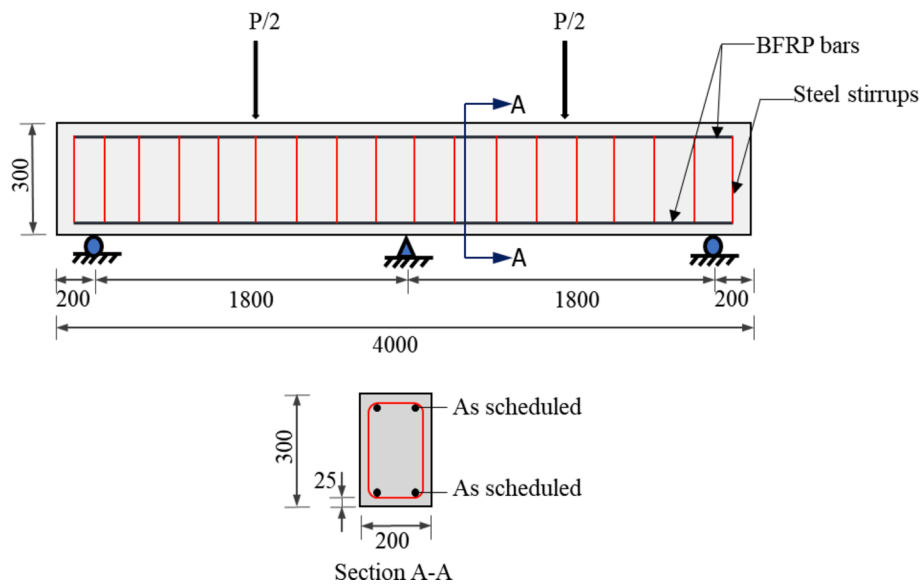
Geometry, main reinforcement details, and loading patterns of the tested beams (all dimensions are in mm).
